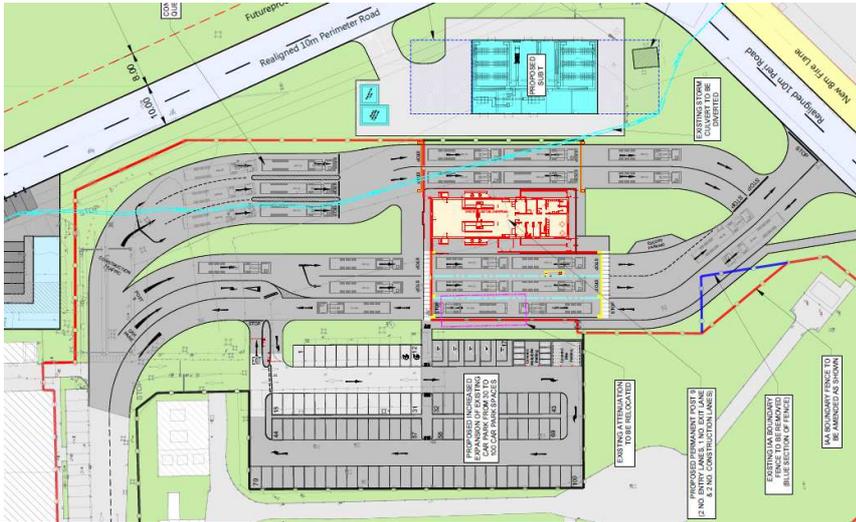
Plan view of the proposed Gate Post 9 layout
